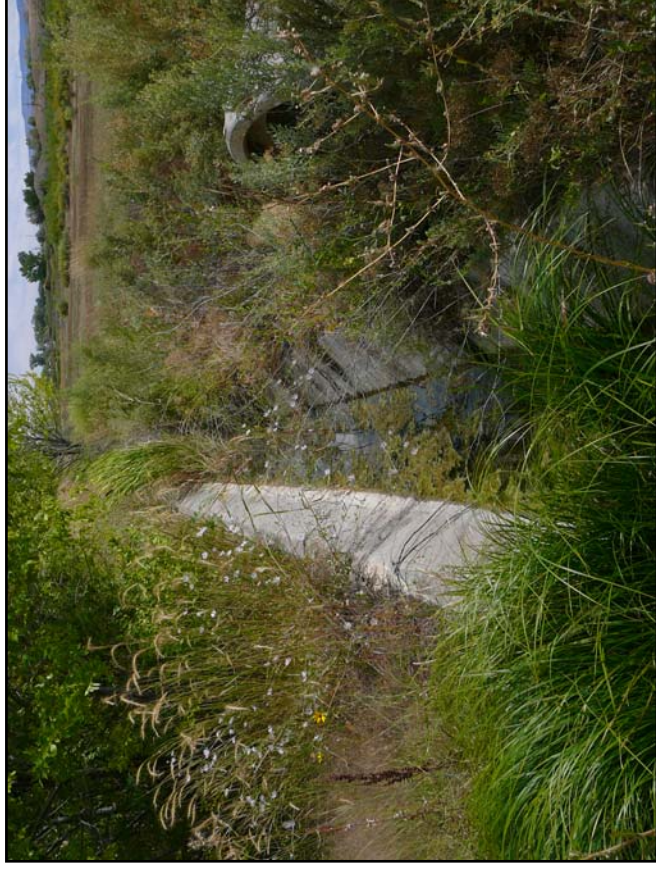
Leakage from concrete ditch in polygon S to road side borrow ditch, looking east, Hwy 6&50 just to left of photo
